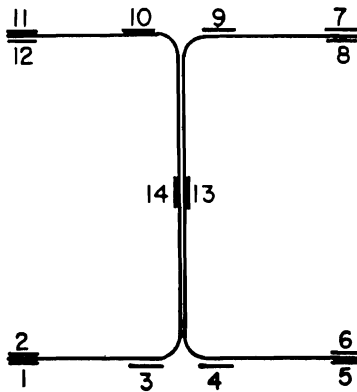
Locations of Strain Gages at Midheight of I-Shaped Stub Columns
